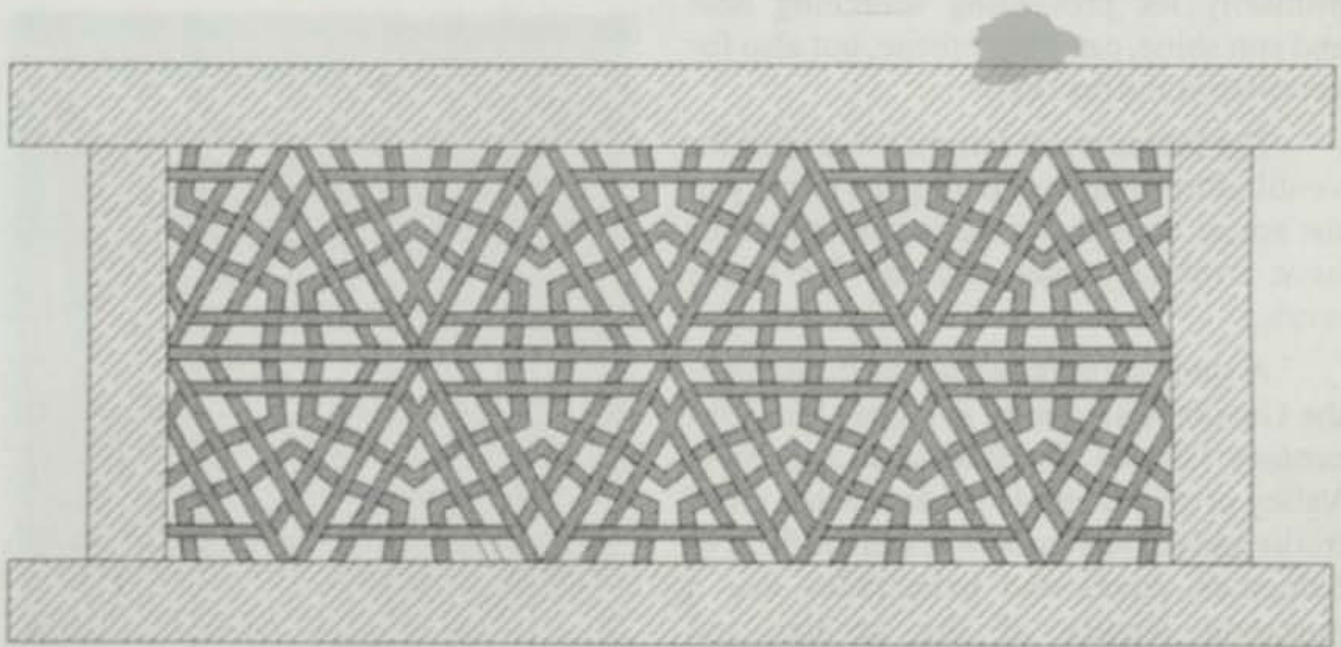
Drawing of wood screen in six corner star geometrical pattern.
